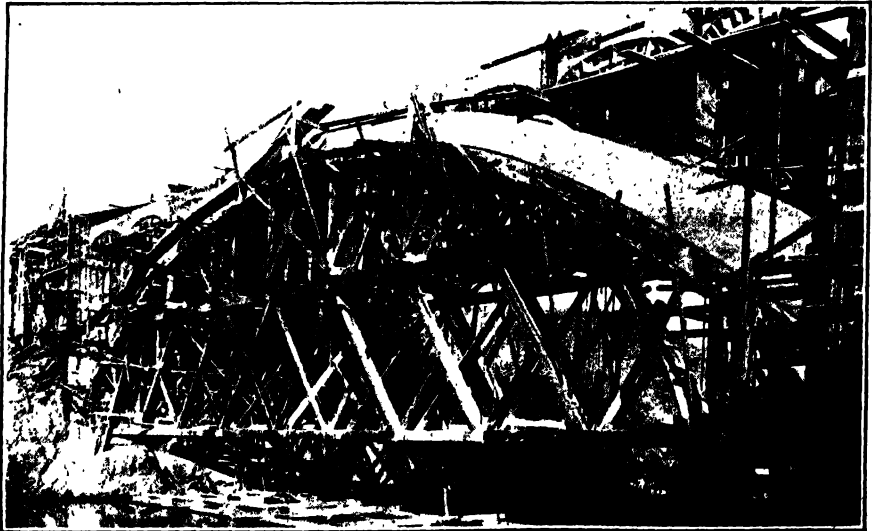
Trussed centering—Rogue River Bridge near Gold Hill, Oregon.
